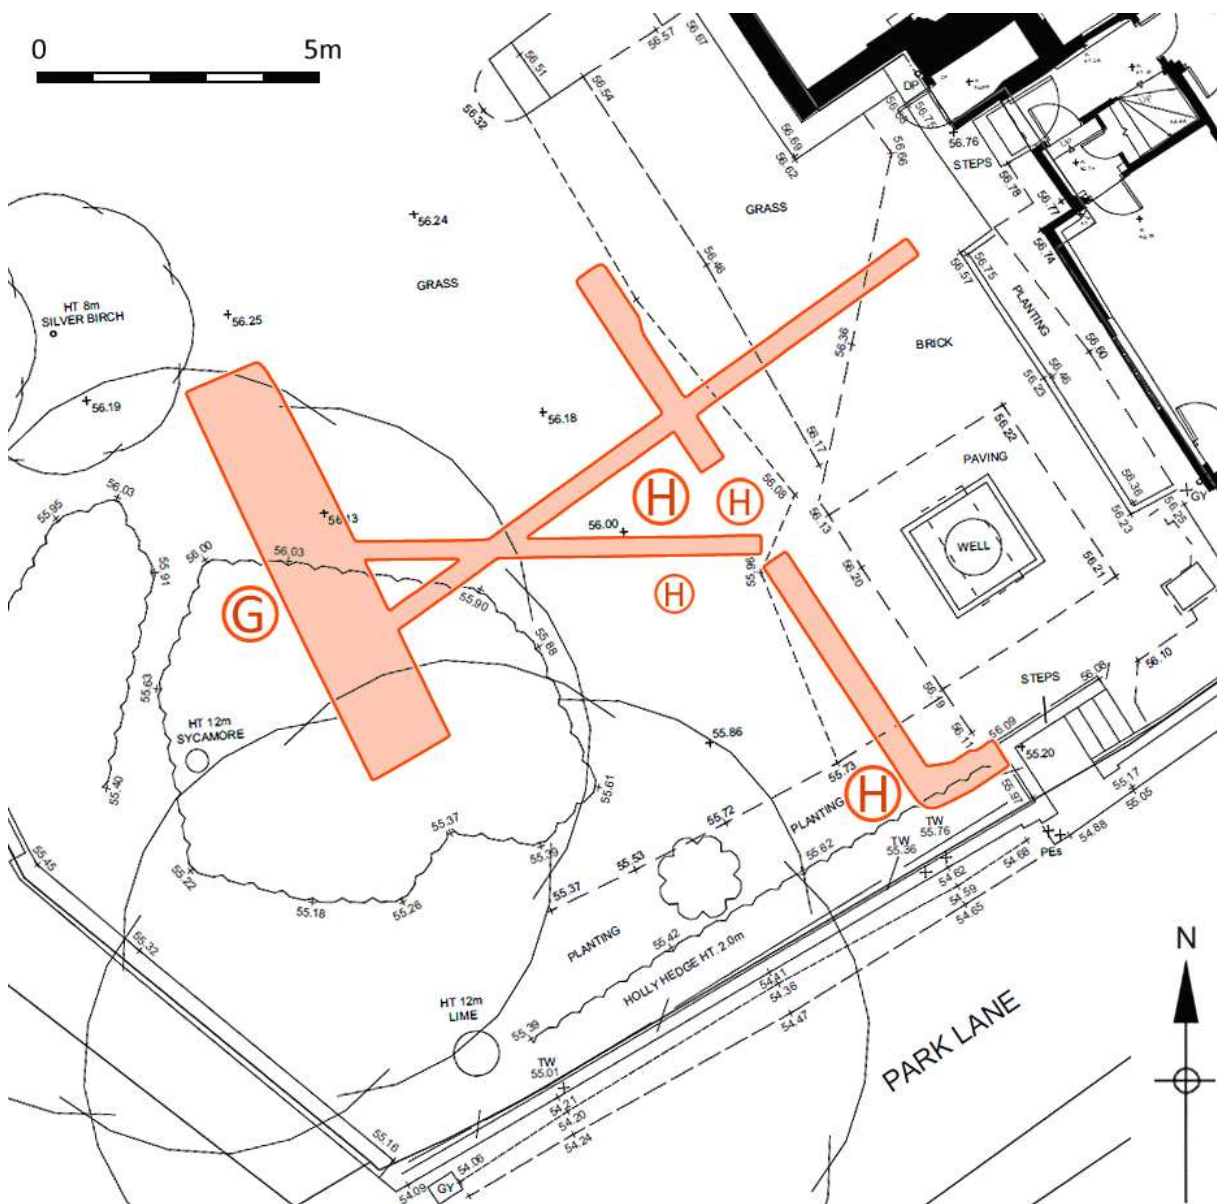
Enlarged plan of the area of drain trenches and wall footings shown in Figs.344 to 354
